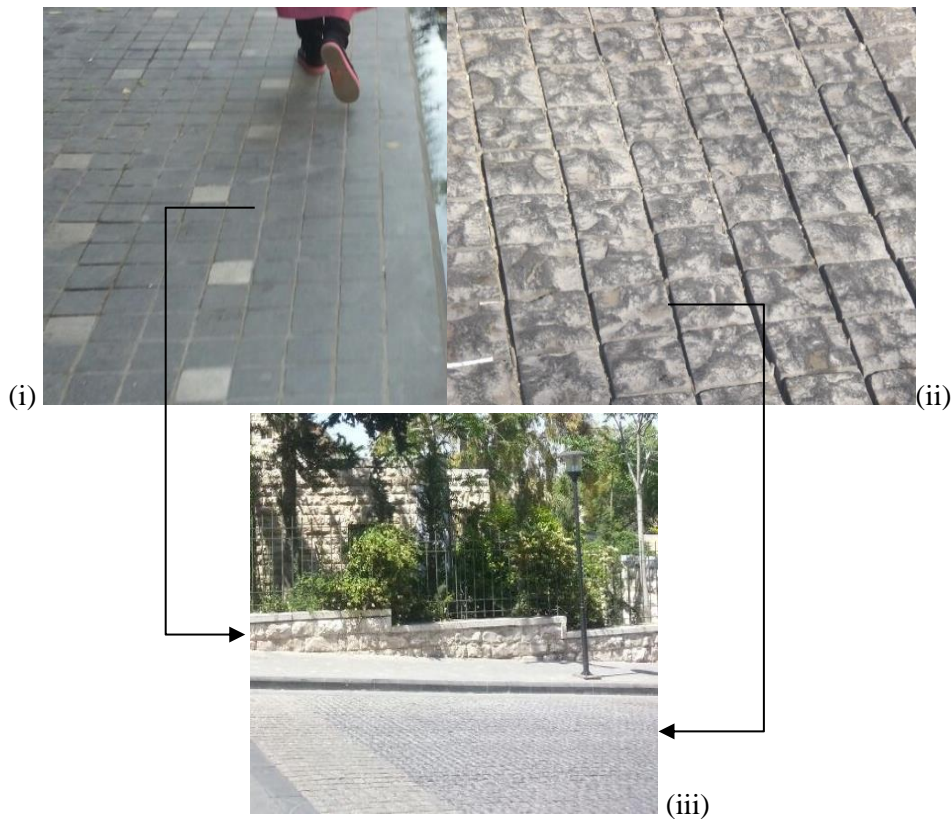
Sidewalk pavement of Bazalt Stone, cut finish (i) and road pavement of Bazalt Stone, light hammered finish (ii) being used at Rainbow Street (iii)
